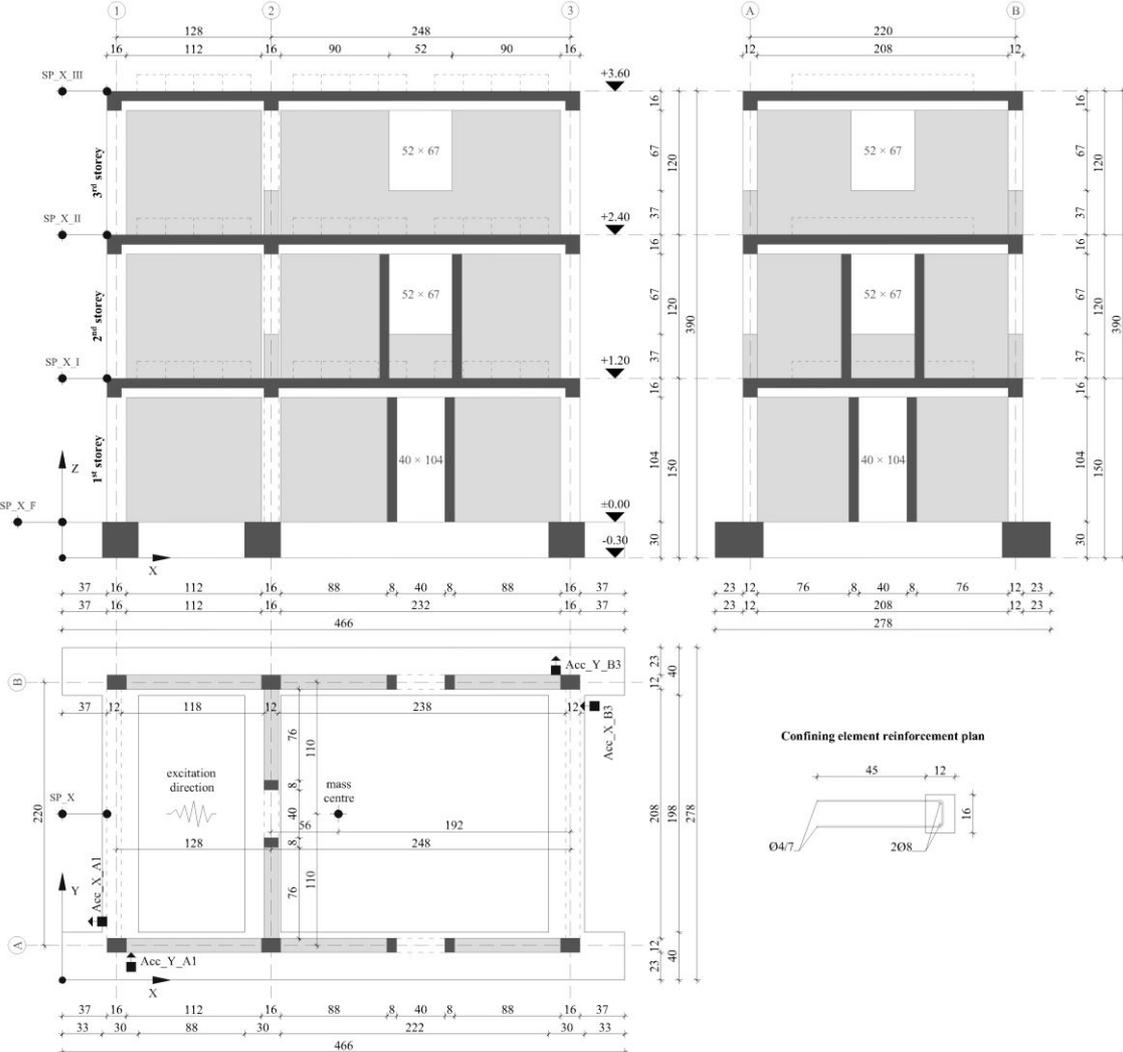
Longitudinal (top left), transverse (top right) and instrument plan views of the Series 2 structure (all dimensions in cm)
